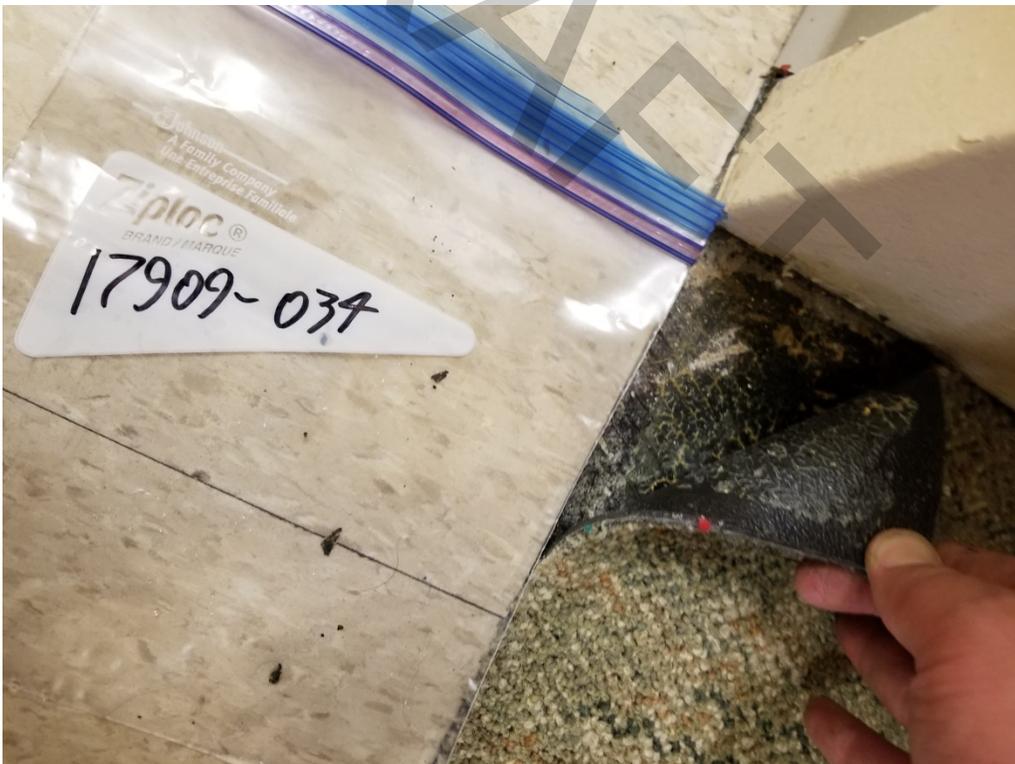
Black mastic beneath found beneath floor tiles and green carpet in the basement. (May 22, 2018)
